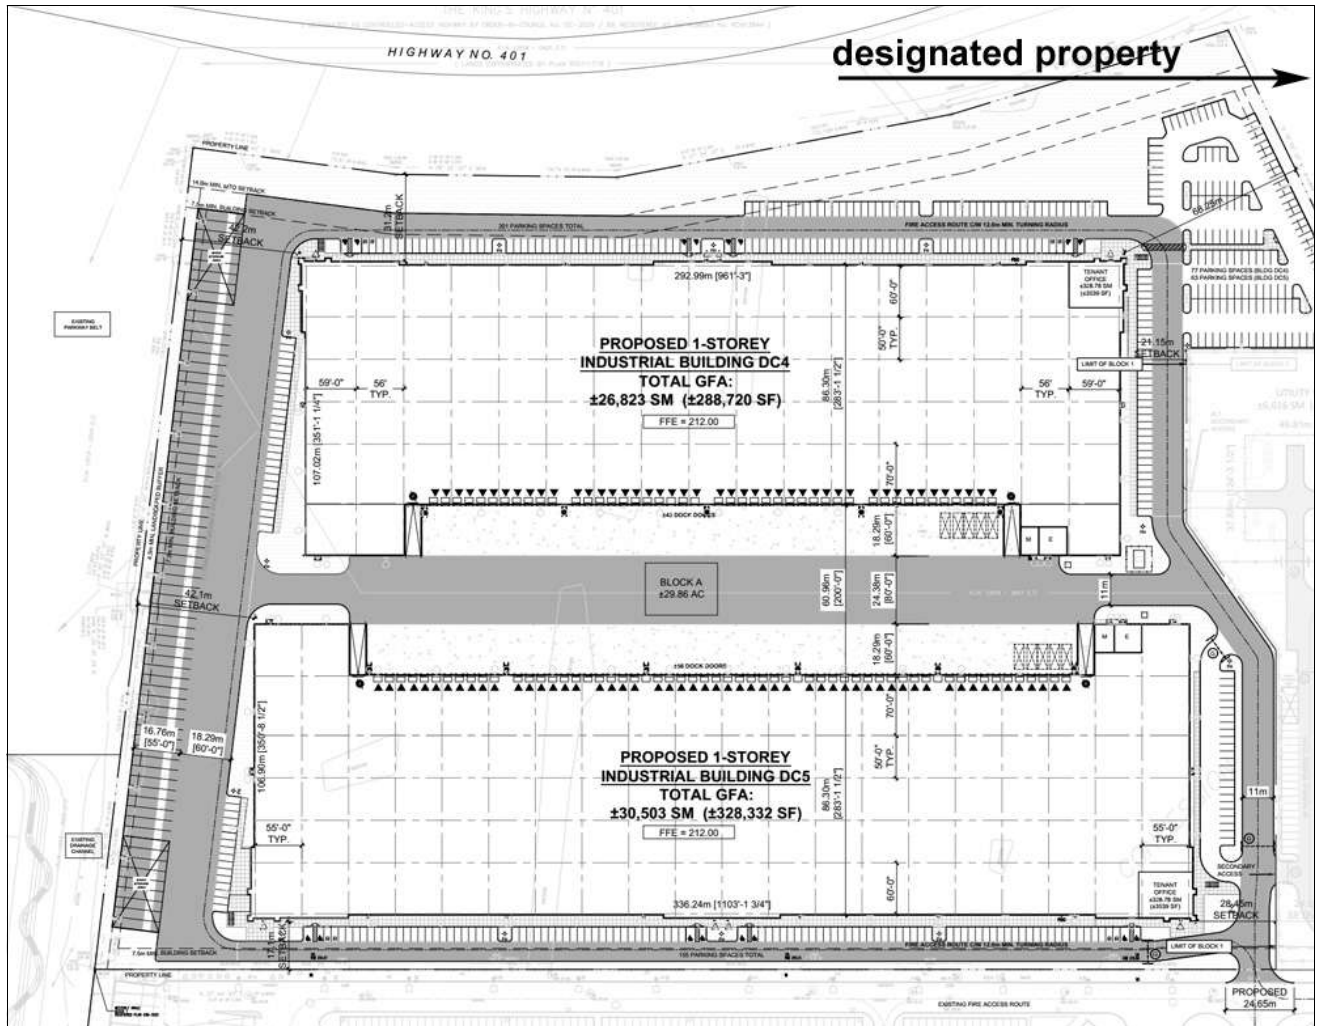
Site Plan, Industrial Buildings - *Petroff Partnership Architects, August 25, 2025
